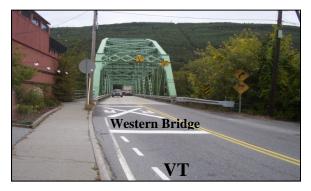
Western Bridge: View from Brattleboro east towards the mid-channel island.
